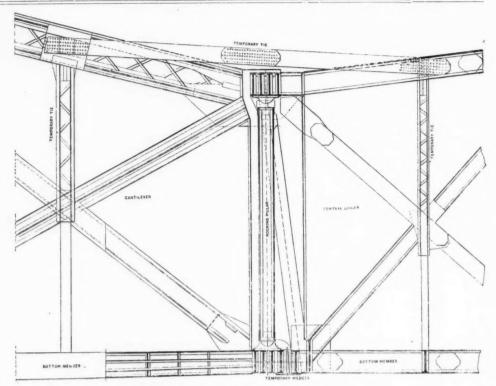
Bed Plates and Pin for Junction of Girder and Cantilever
